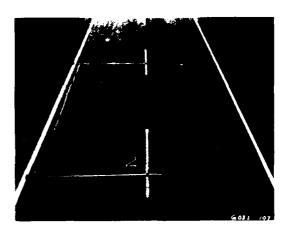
Road widened 2 ft on each side for a total width of 24 ft with gravel shoulders
